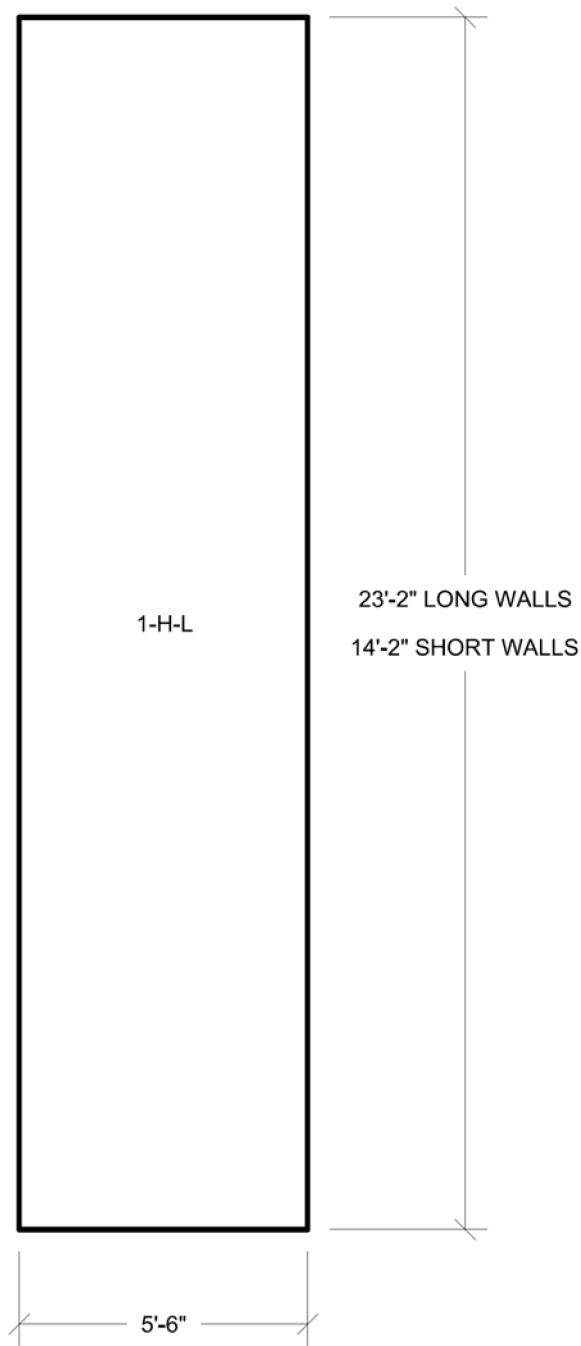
H.7-9 Access Region Walls Looking From Outside Horizontal Reinforcement Zones Near Side and Far Side Faces
